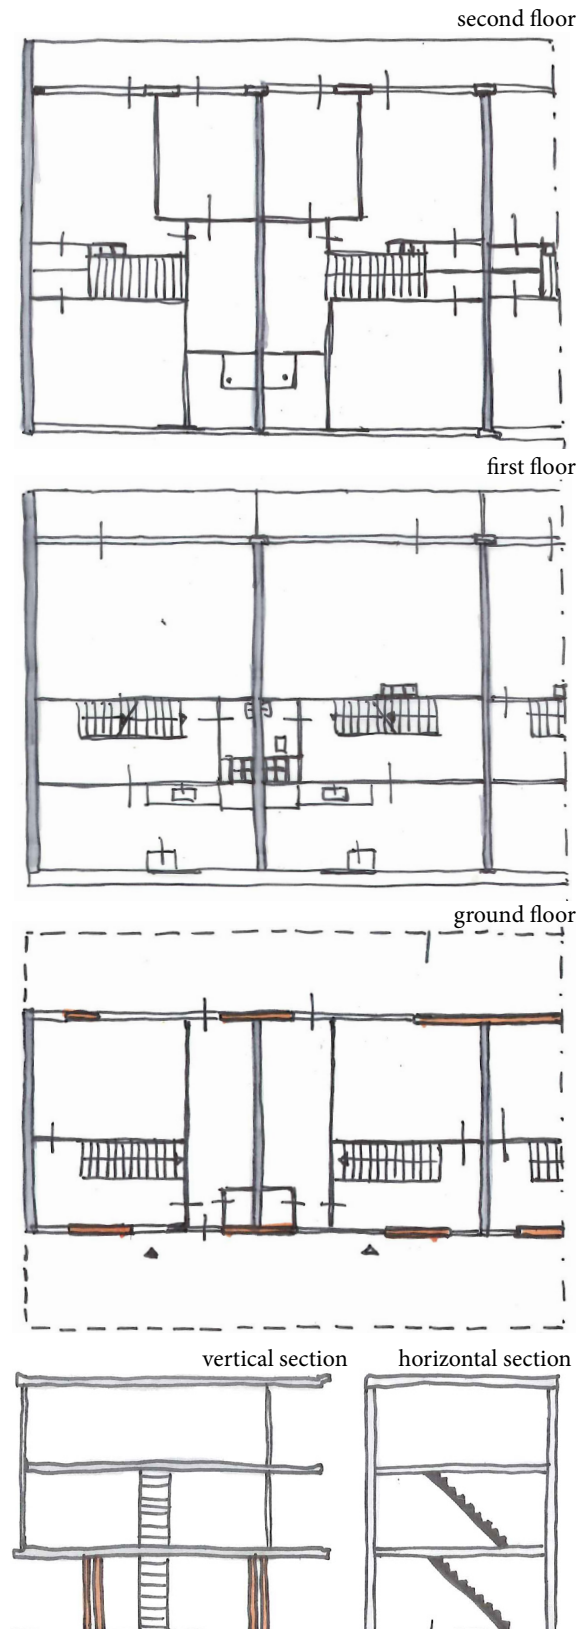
Plans and section of the concrete structure of the houses in Vrieheide. The cavity walls and stairs provide the stability of the building block (own ill.).
